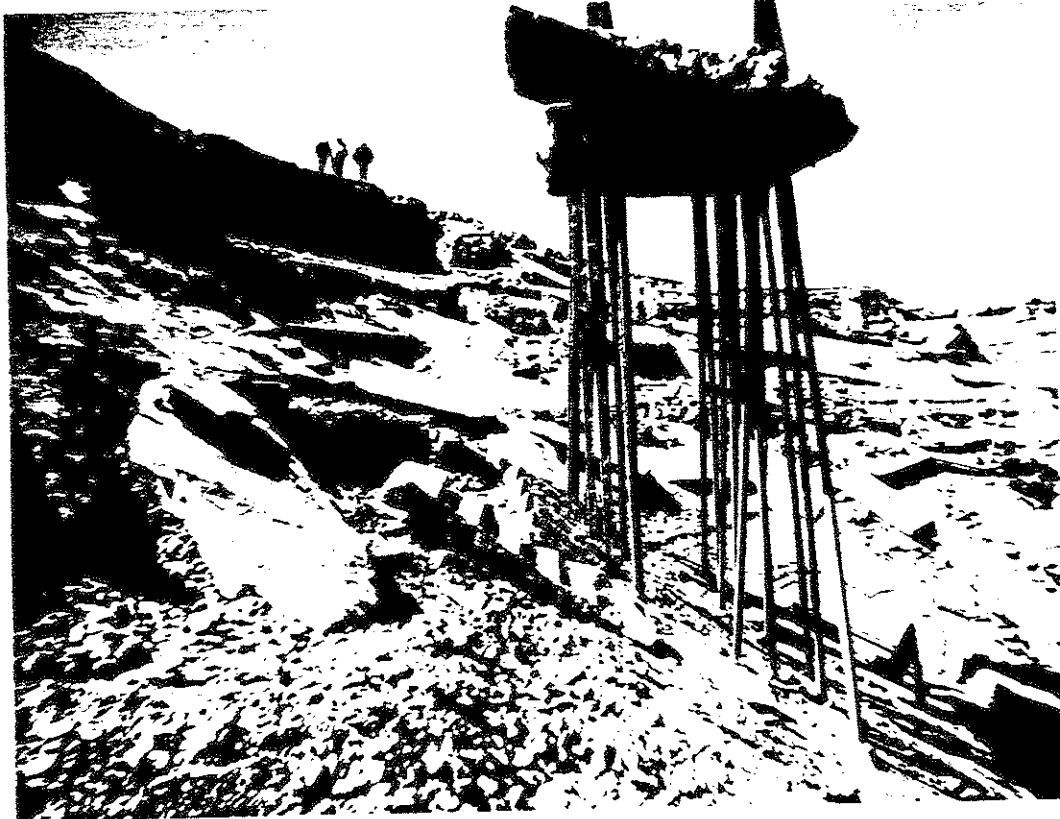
PILE-SUPPORTED FOOTING FOR BRIDGE TO
